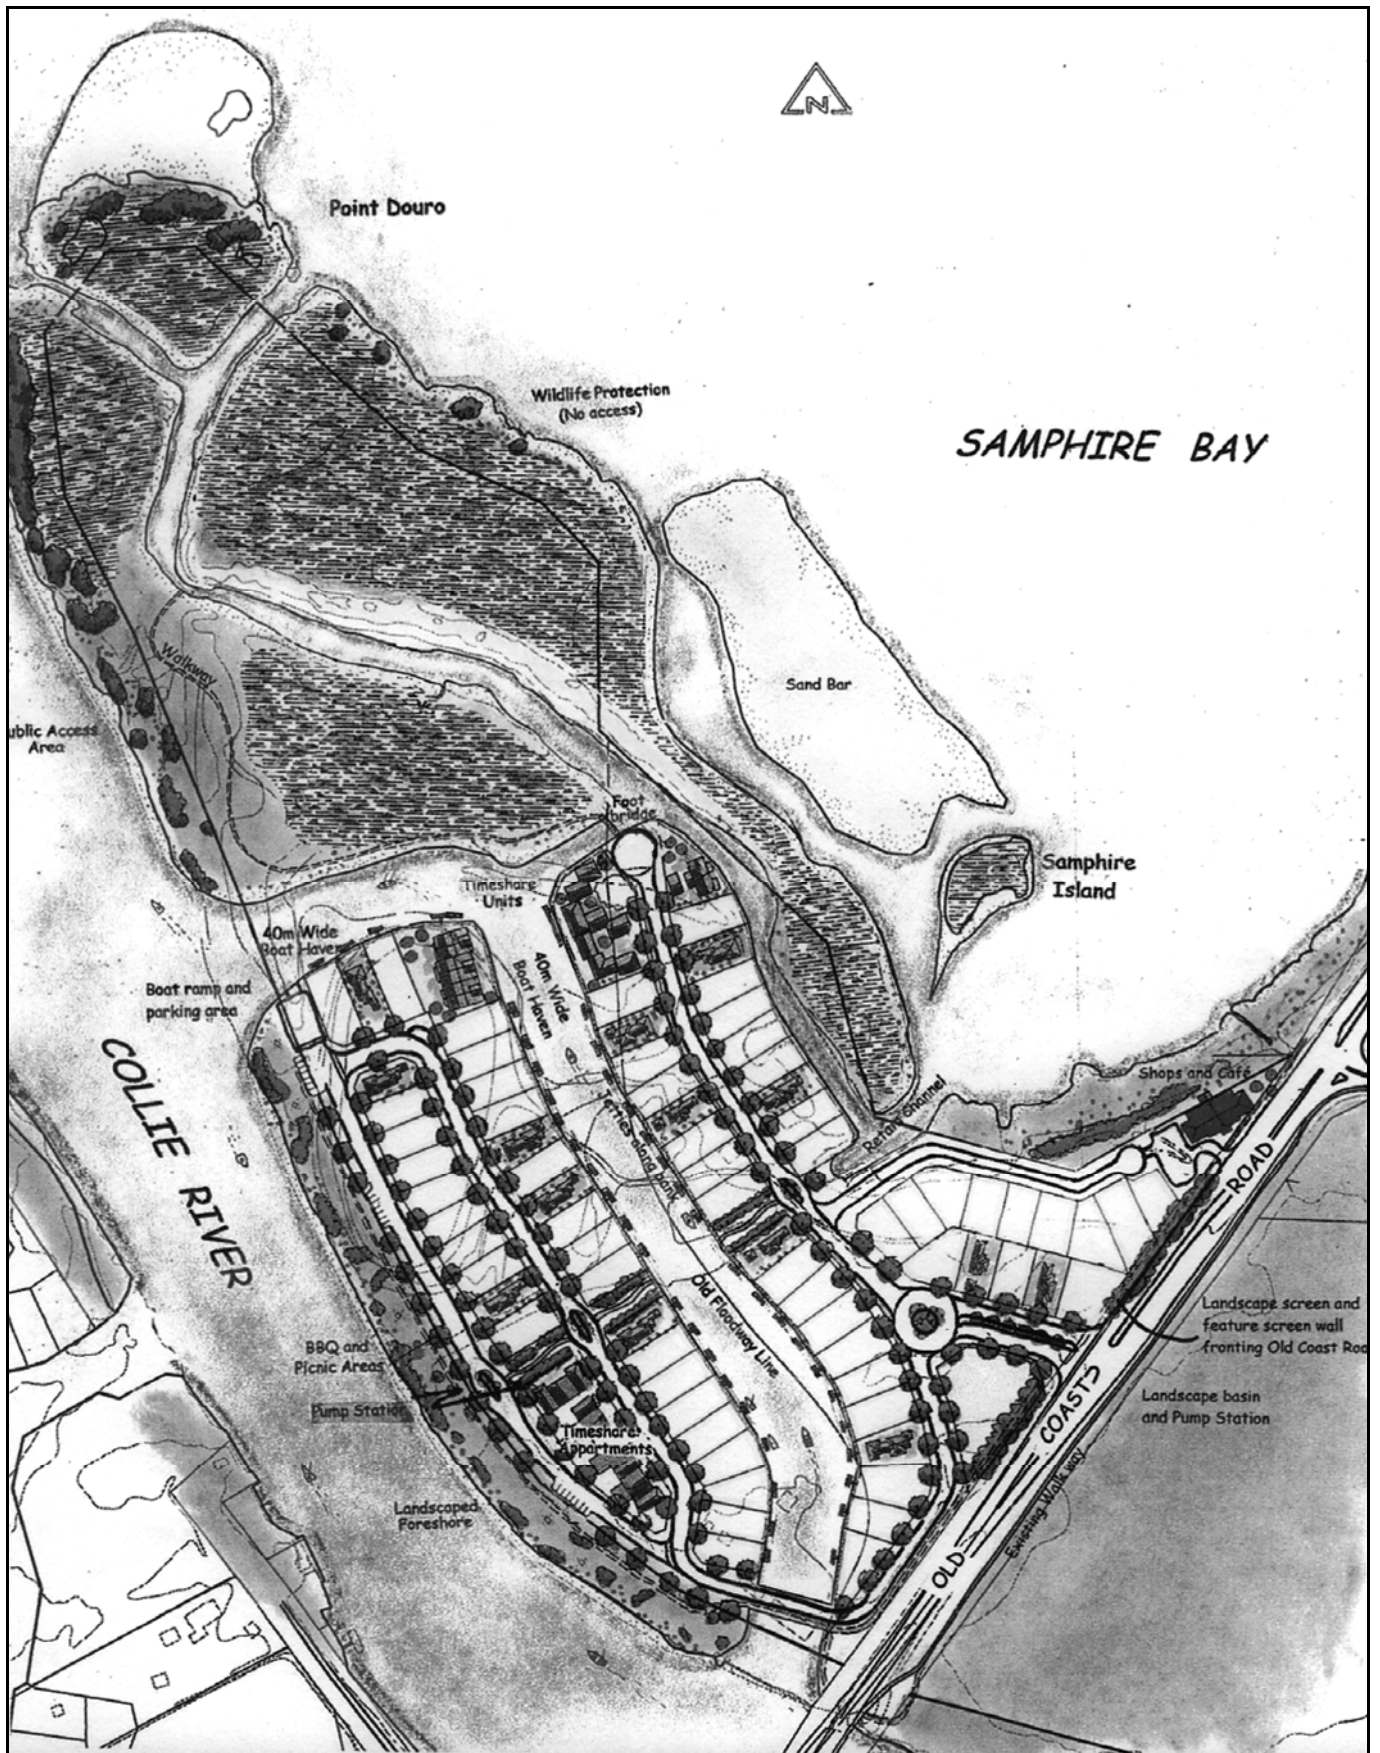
Concept Development Plan (01) as originally proposed under Amendment No. 13
